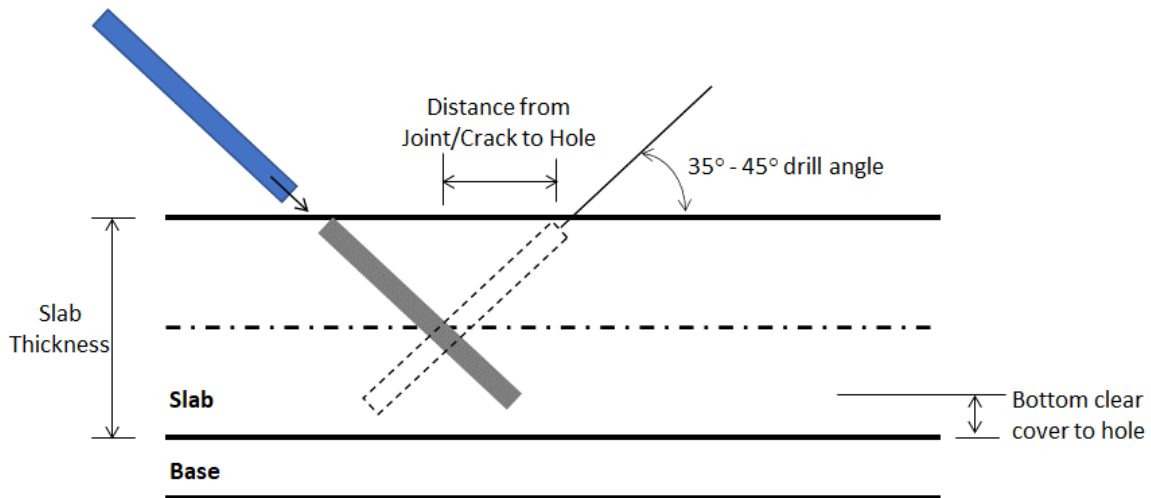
Cross-section view of cross-stitching (redrawn from IGGA, 2010).
